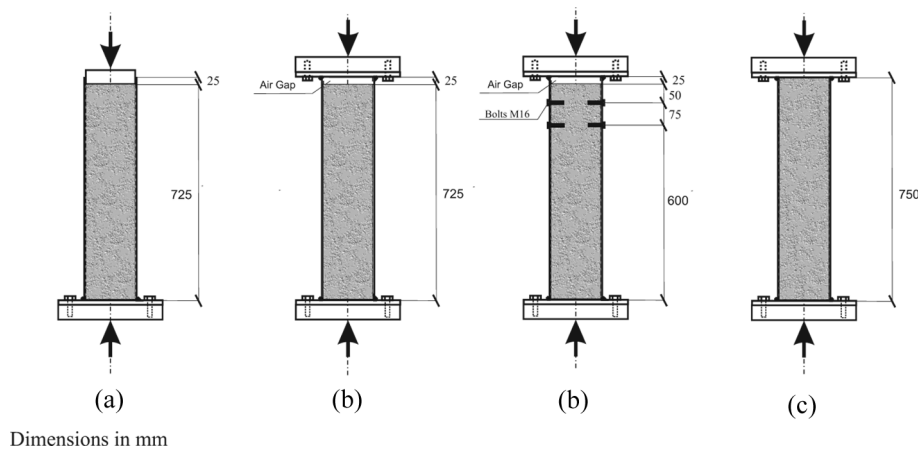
(a) SP type of loading, (b) S type of loading, (c) A type of loading
